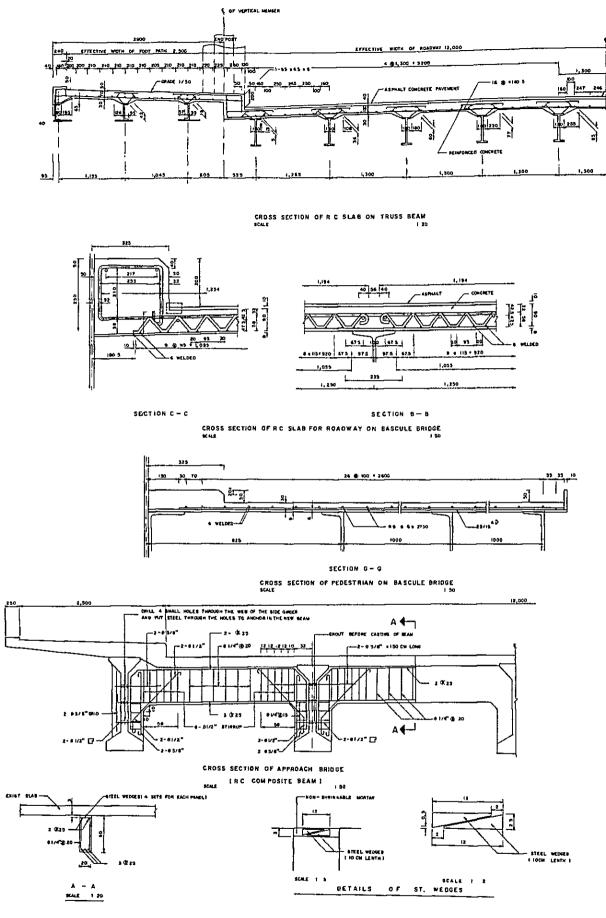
EXISTING FLOOR SLABS ON THE TRUSSED BEAM, BASCULE BRIDGE AND PC COMPOSITE BEAM OF THE APPROACH BRIDGE
